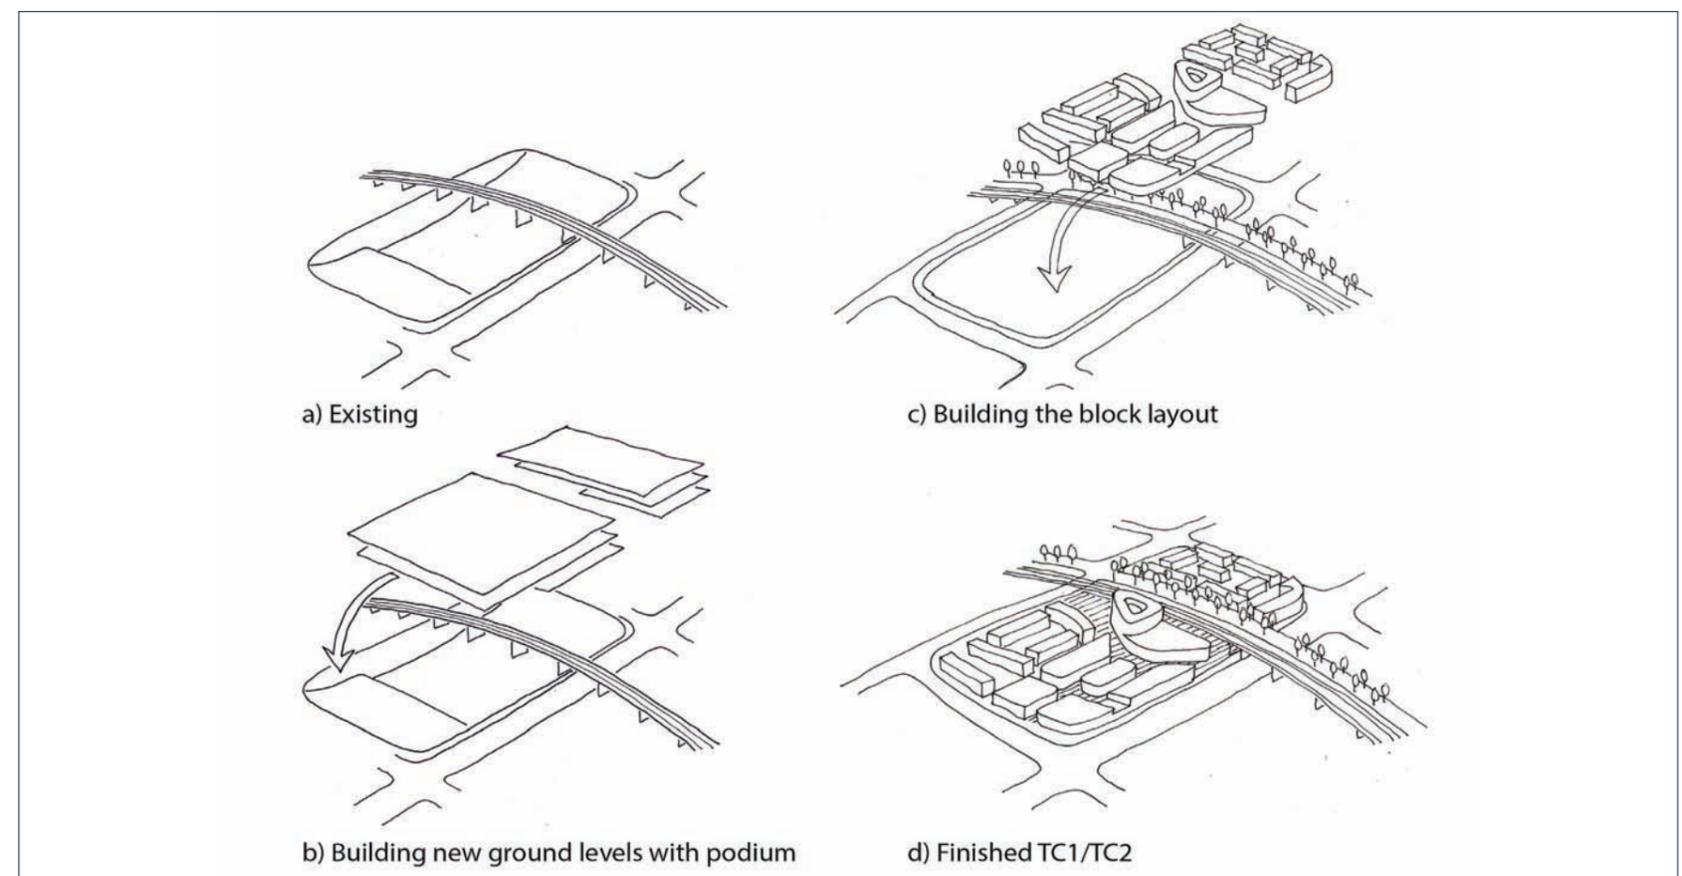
Building a New Ground Level – Concept Diagram showing TC1 and TC2
